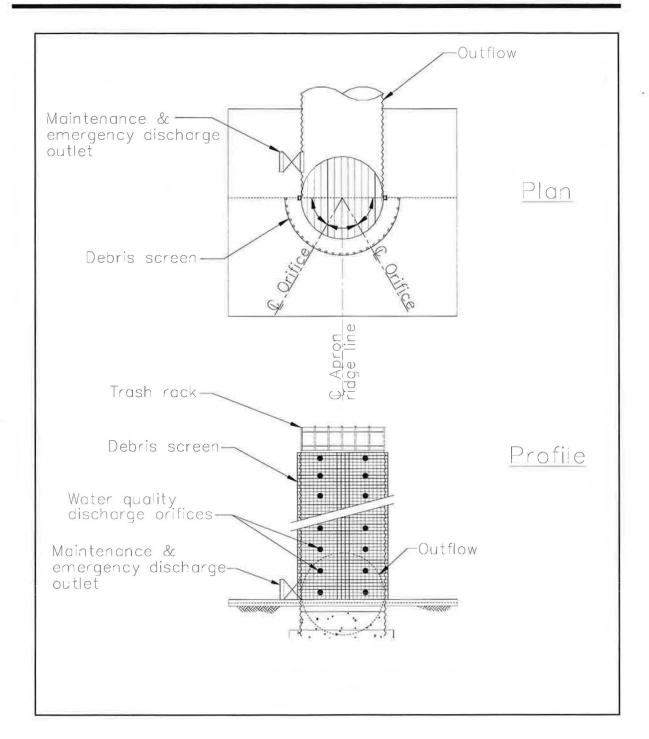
MULTIPLE ORIFICE OUTLET RISER NOT TO SCALE
